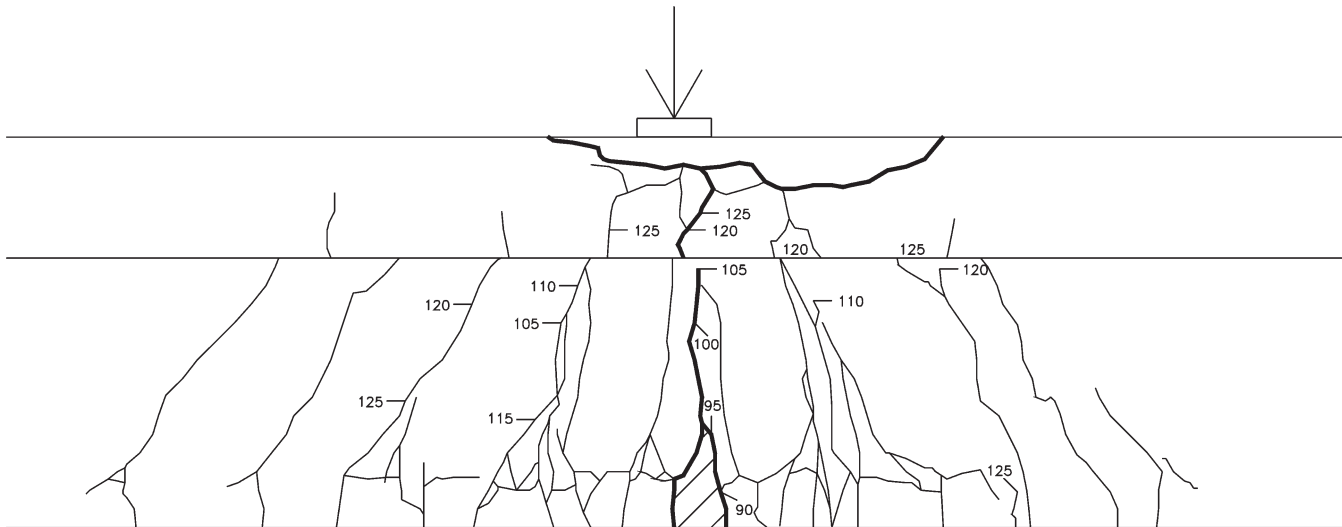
Crack patterns at failure of multiple-strand development length specimen HPC-1 (north face).
